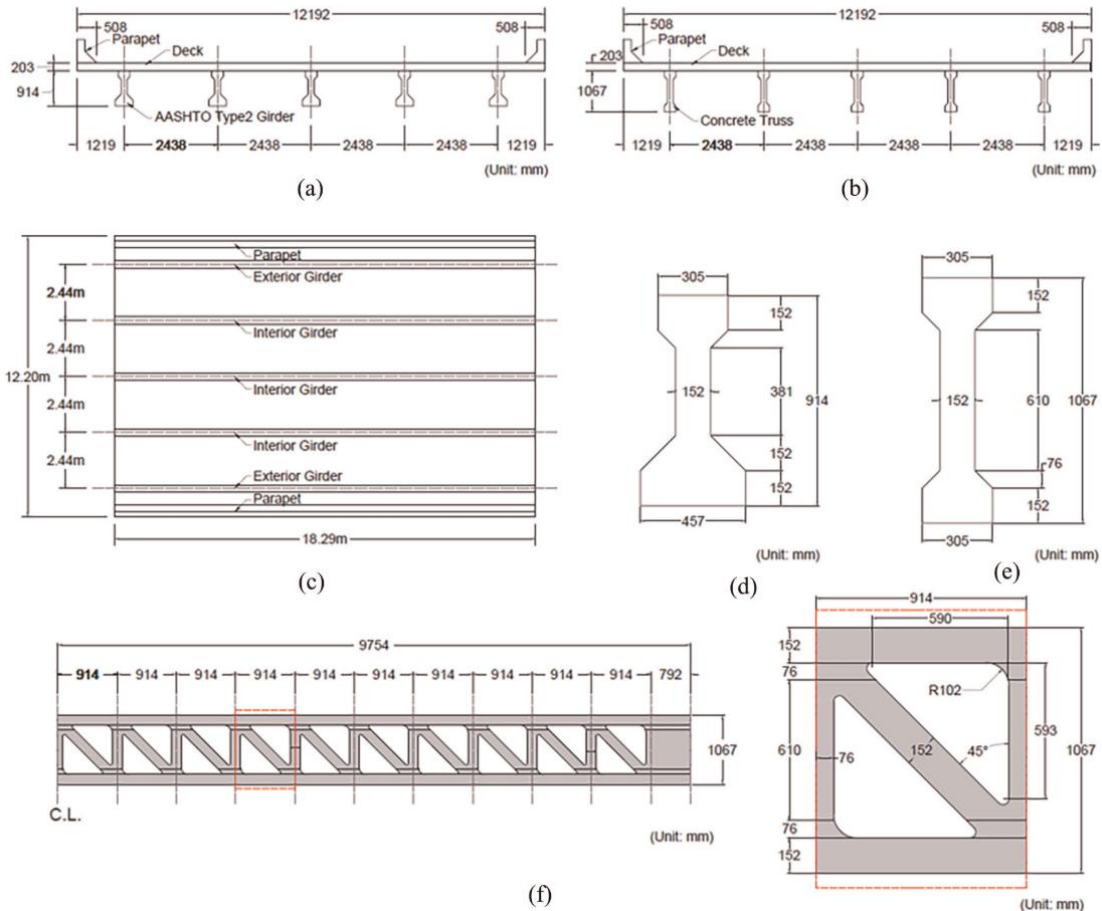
Cross-section of (a) reference bridge using AASHTO type 2 girder, (b) concrete truss bridge, (c) plan-view of bridge models, cross-section of (d) AASHTO type 2 girder, (e) concrete truss, and (f) elevation of concrete truss.
